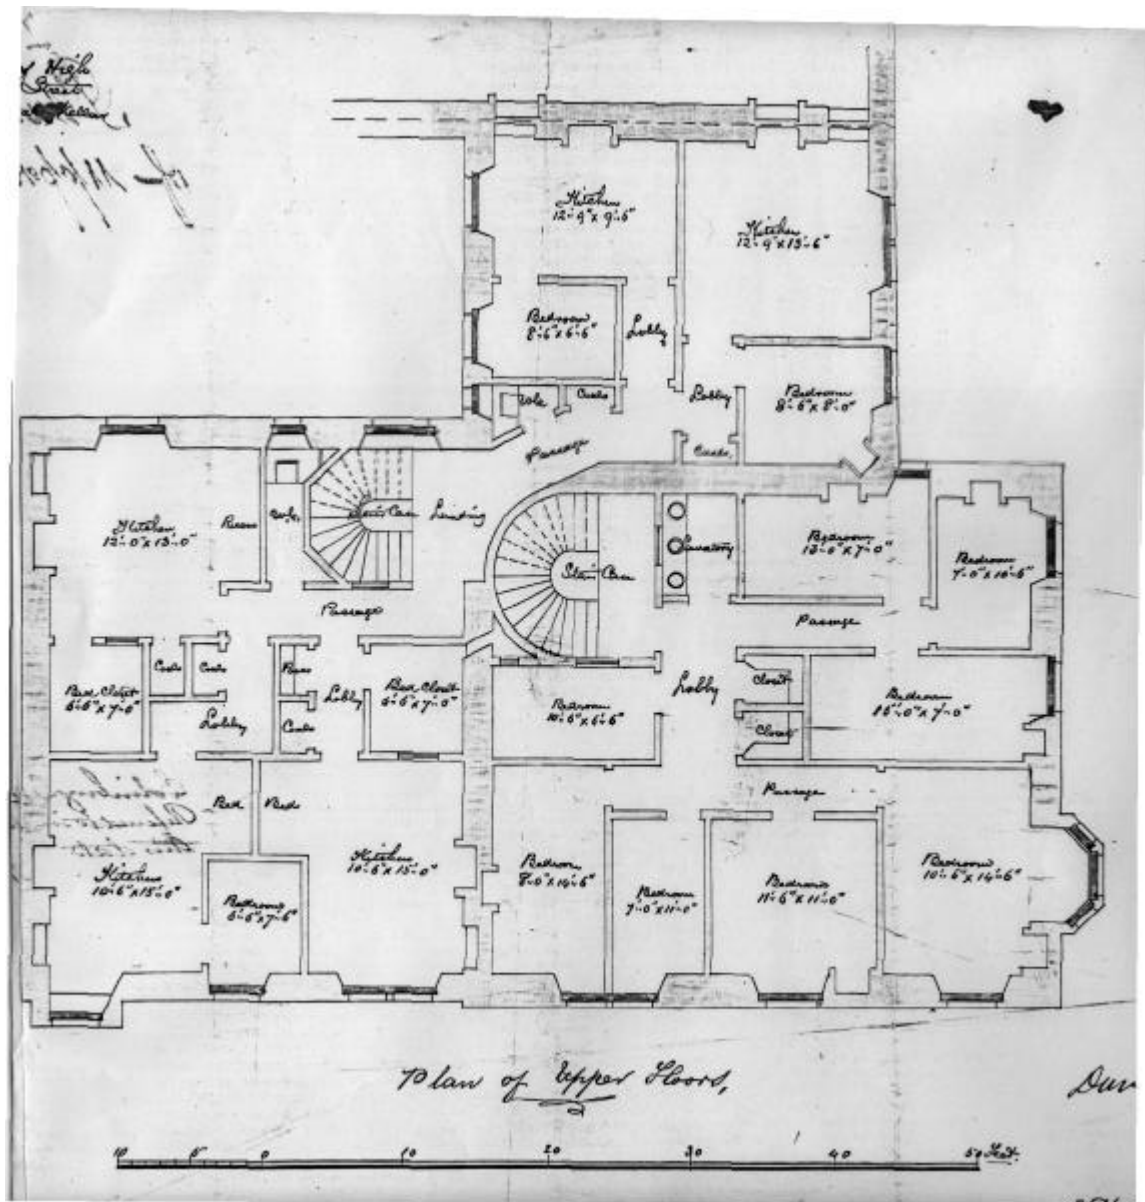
Plan of one floor of new tenement in Blackfriars Street – 1871
